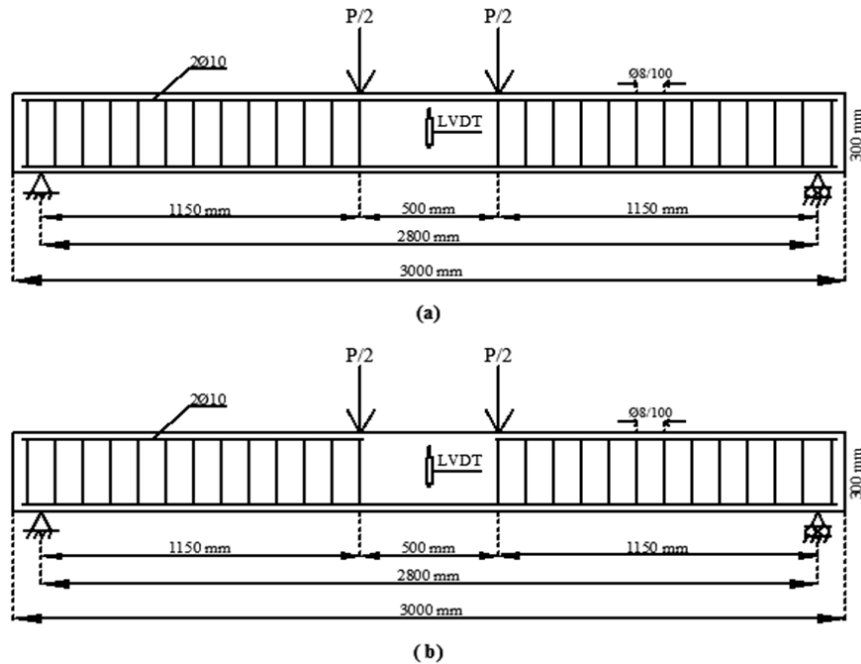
Loading and support conditions and transverse reinforcement details of the beams cast in the (a) first batch (with compression reinforcement in the central region) and (b) in the second batch (without compression reinforcement in the central region)
